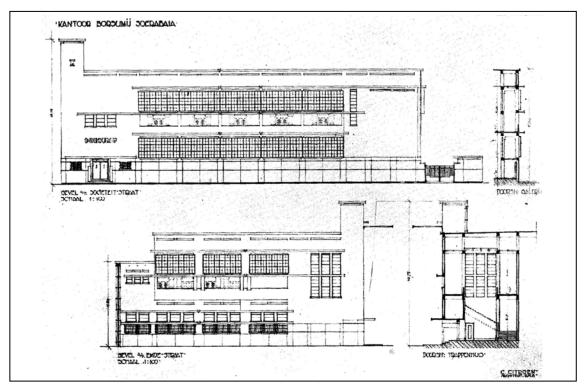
Borsumij Office, Surabaya: elevations and sections (details).
